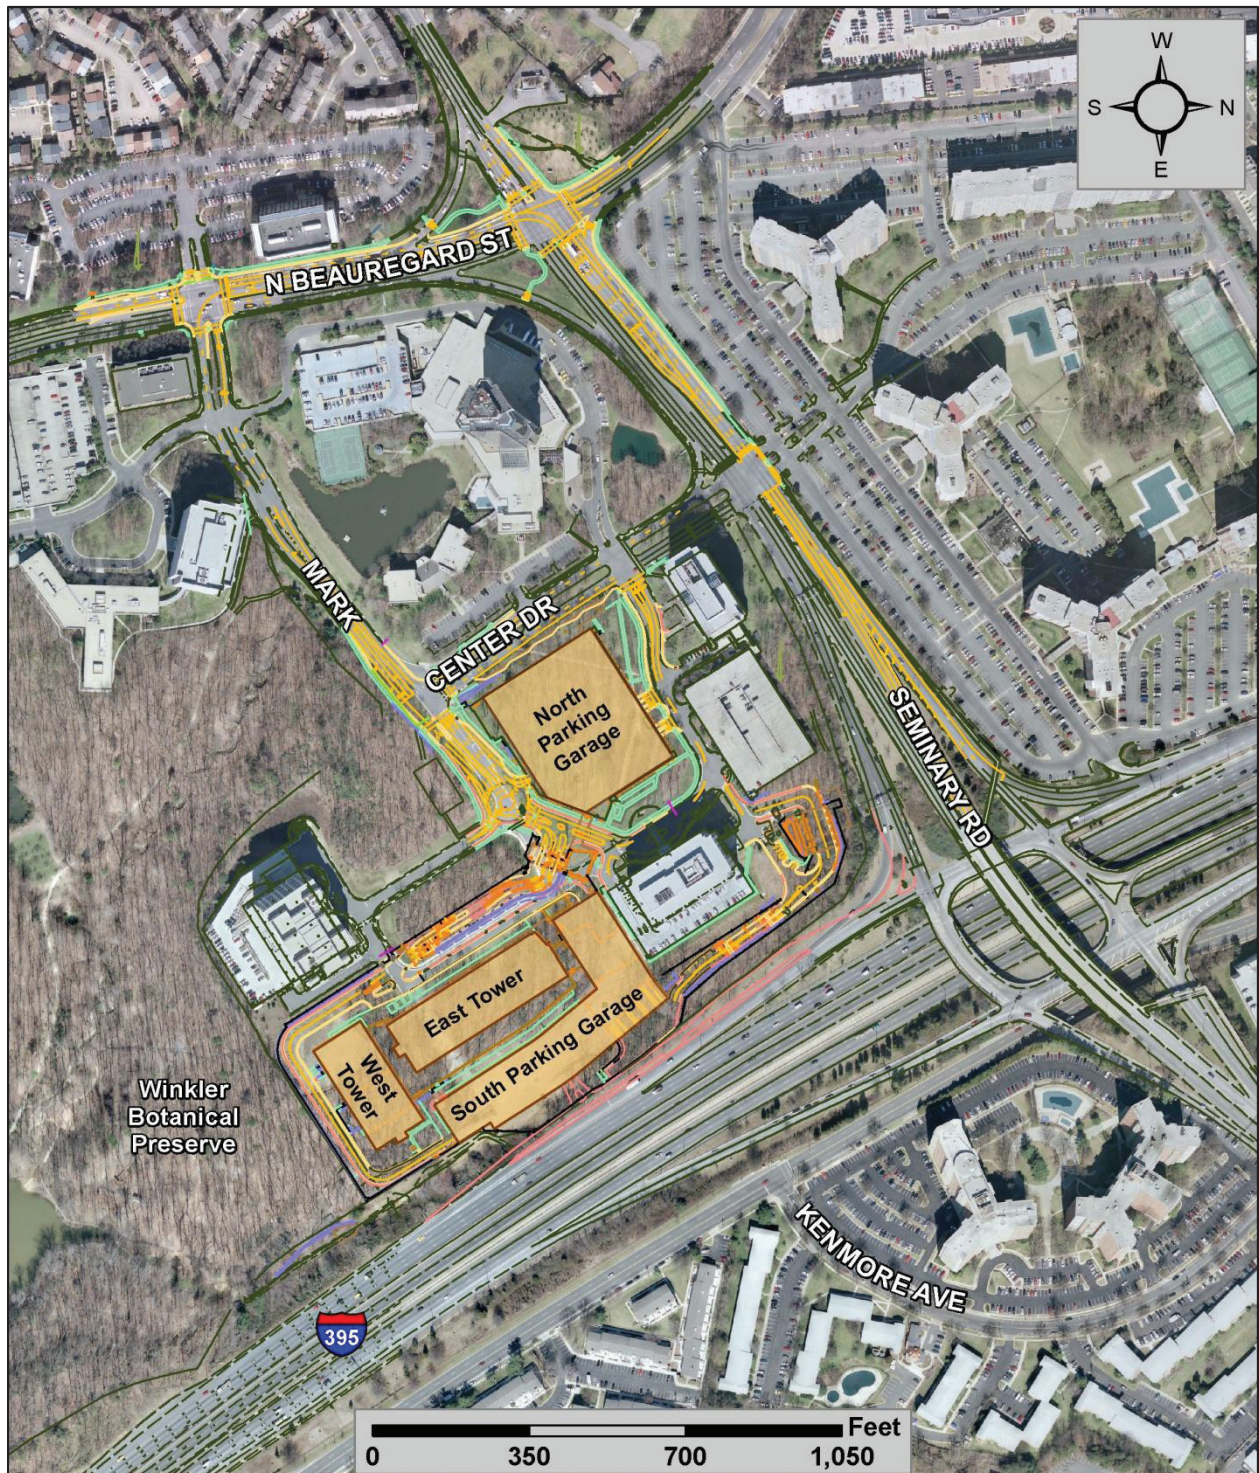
shows an overall site plan highlighting the proposed BRAC 133 development and the adjacent roadway network.
